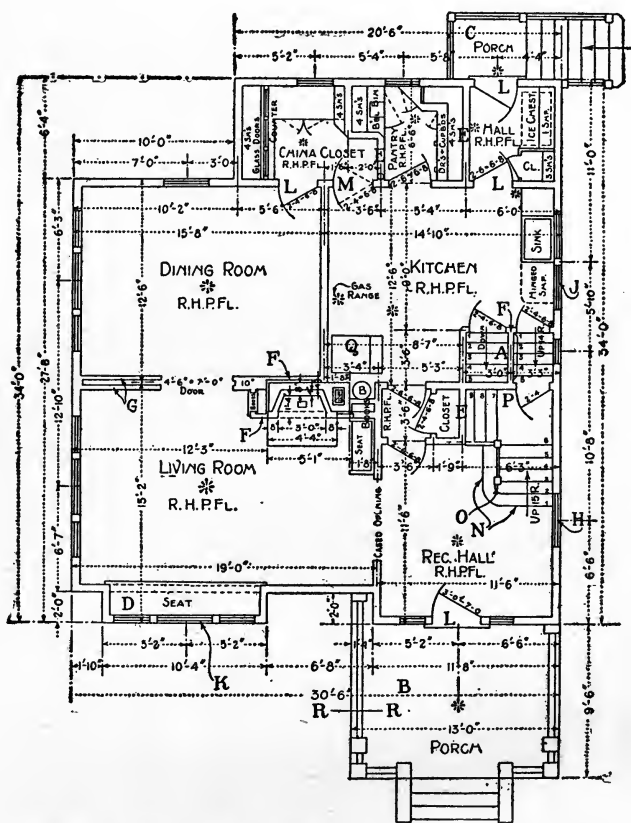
FIRST FLOOR PLAN—SCALE  $\frac{1}{2}$  IN. TO THE FOOT
